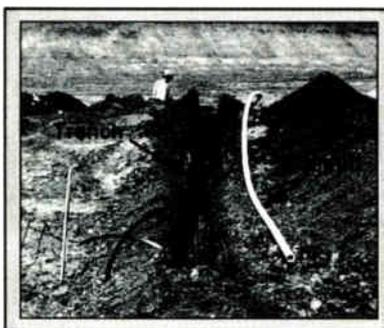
Typical size and depth of conduit for trunk and feeder coaxial cable
